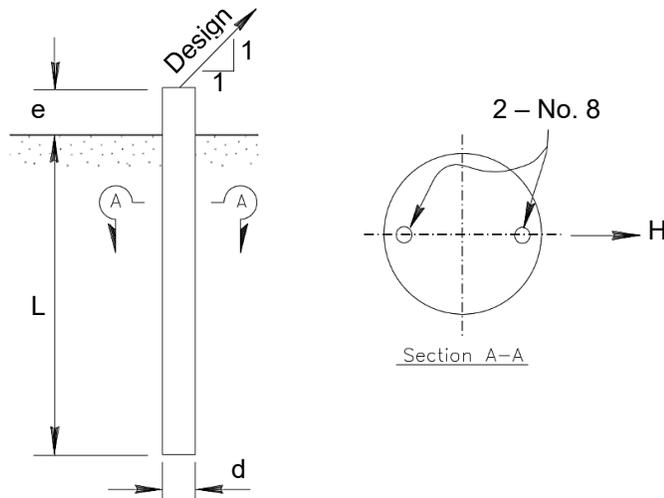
Laterally Loaded Pile with Reinforcement
